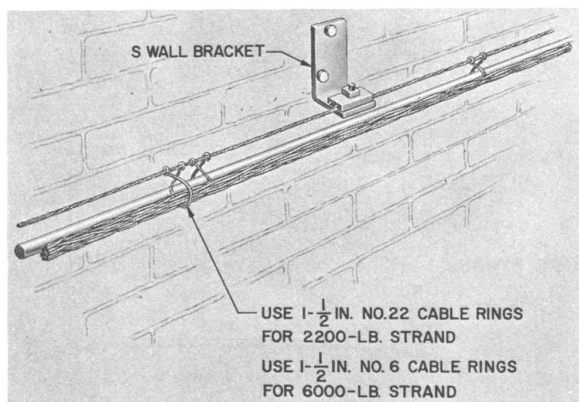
Wire Run in Cable Rings Paralleling Cable Supported with Strand
